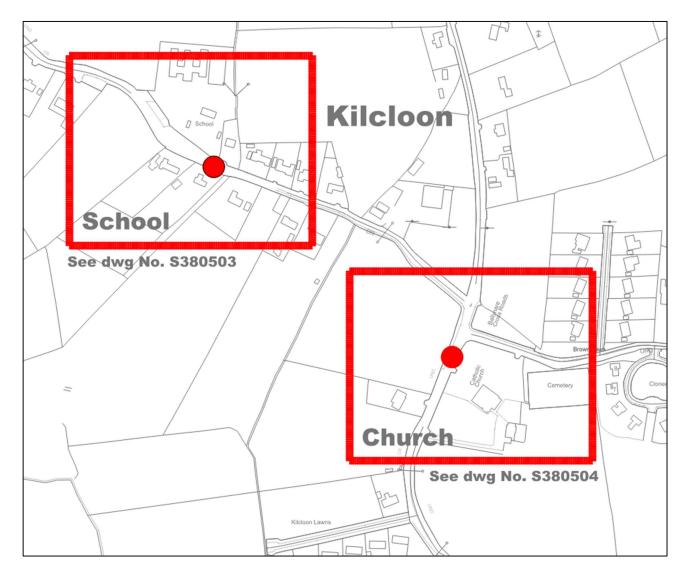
Proposed Site Location of Kilcloon Traffic Calming Scheme
